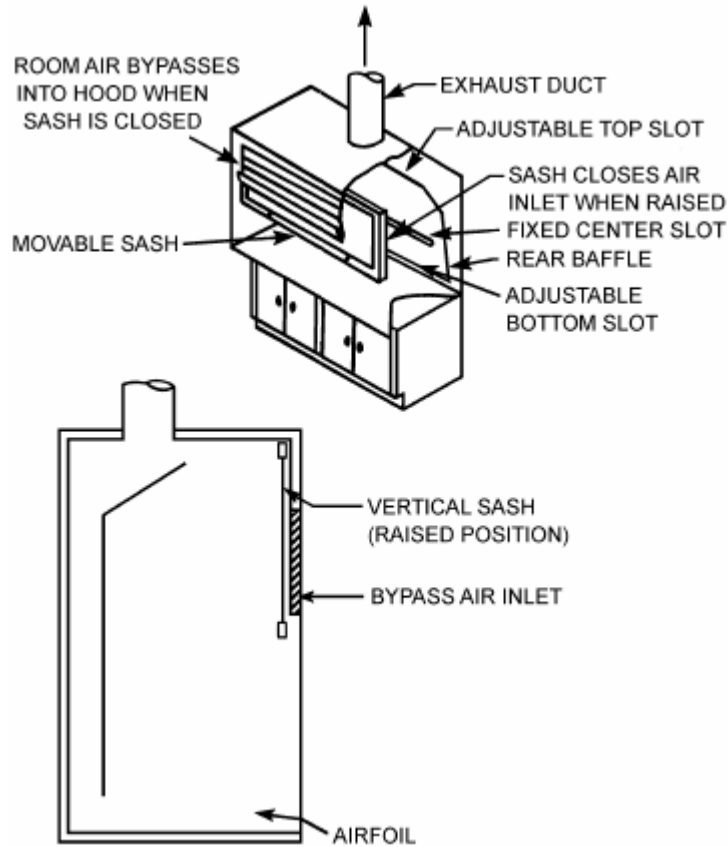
Bypass Fume Hood with Vertical Sash and Bypass Air Inlet
